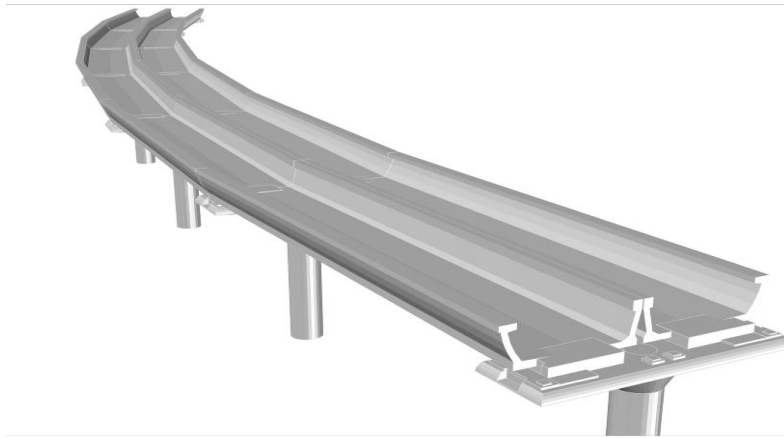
Box Girder Supporting 2 Tracks – Precast Segmental
